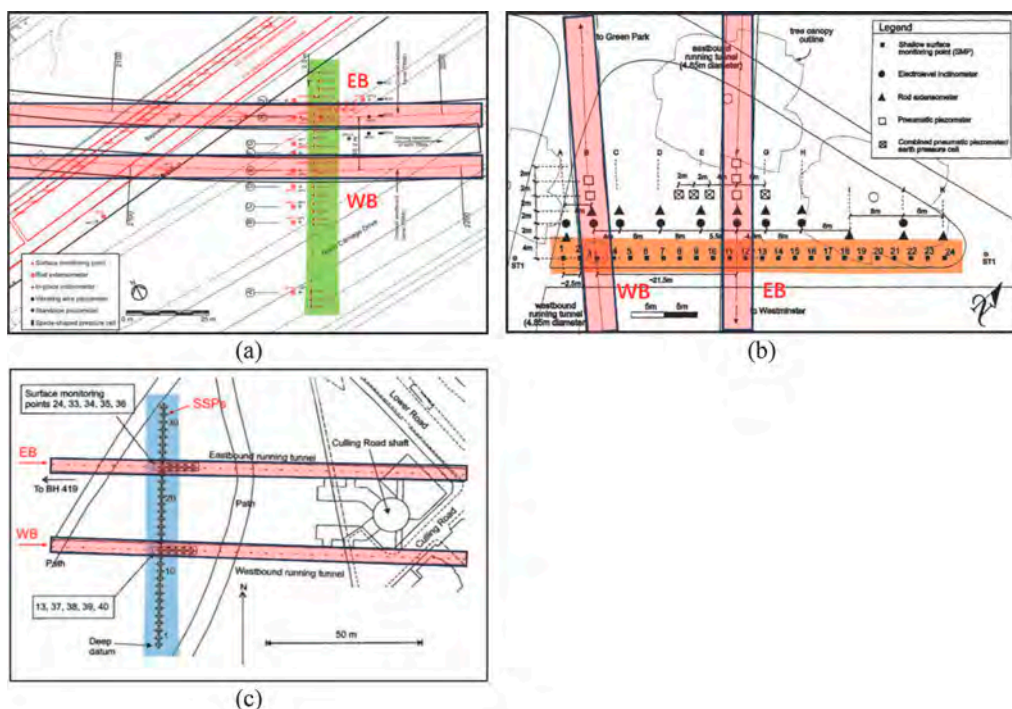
Plan views of the detailed instrumentation of three tunnelling cases in: (a) HP (b) SJP (c) SP.
